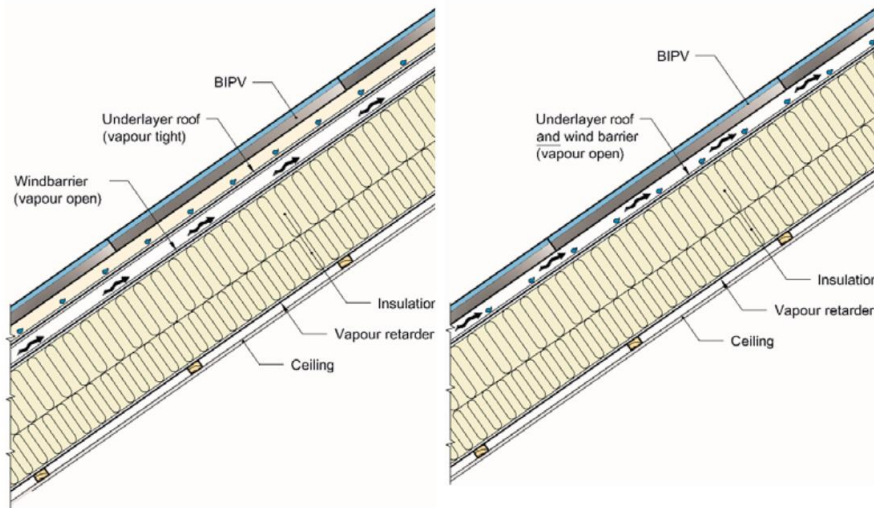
A roof construction with (left) a separate wind barrier and an underlayer roof and (right) a combined wind barrier and underlayer roof [19].
